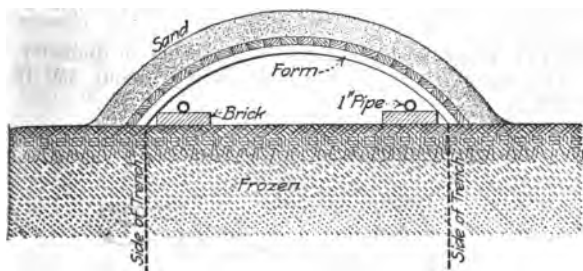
Cover and Steam Pipes for Thawing Ground.
